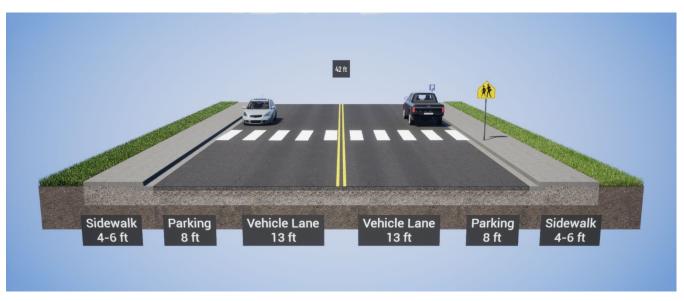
Proposed Typical Roadway Configuration of Segment 1A: St. Johns Blvd Typical Cross Section (looking north)
